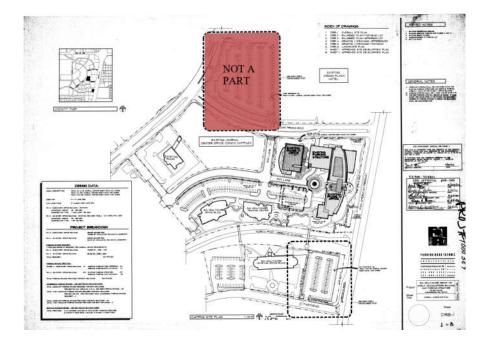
Existing Controlling Site Plan (subject site will get removed with approval of this request)
